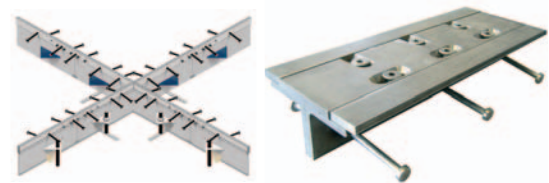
above left: AlphaJoint ‘leave in place’ formwork providing 2 × 10mm-wide flat steel strips to provide the joint arris armouring with Diamond Dowels providing the load transfer.
